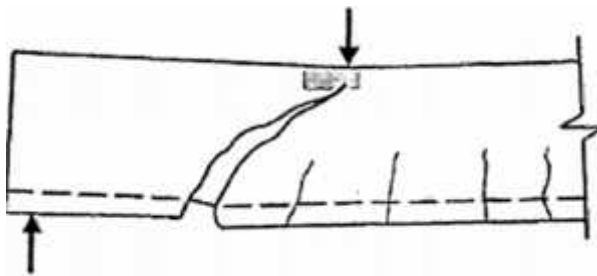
Shear compression failure in short beams (Yalavarthy, 2010)
